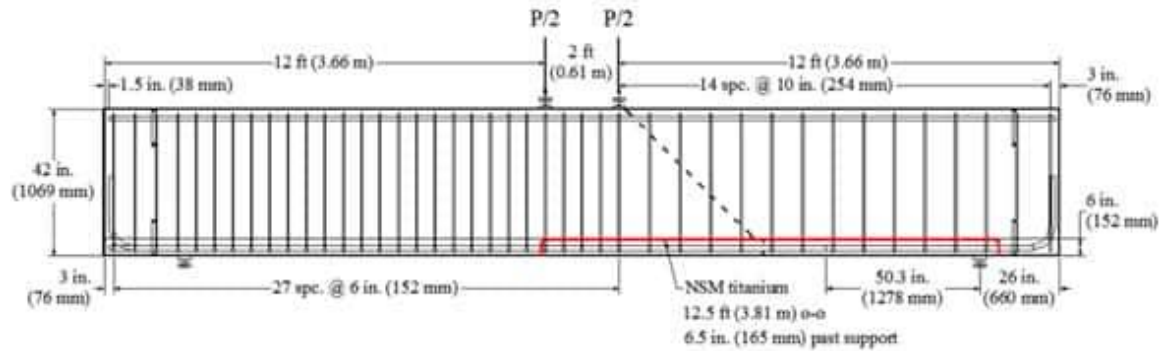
Specimen with preformed diagonal crack and strengthened with TiAB (Barker, 2014)
